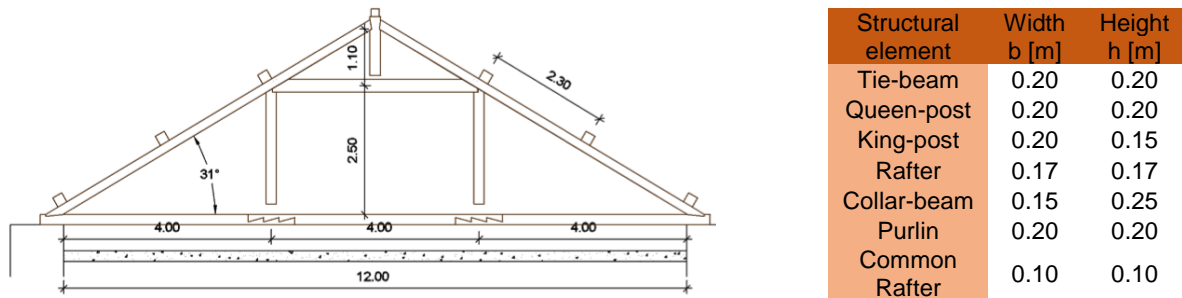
Runa Military Asylum: dimensions of the truss and sections of its structural elements.
